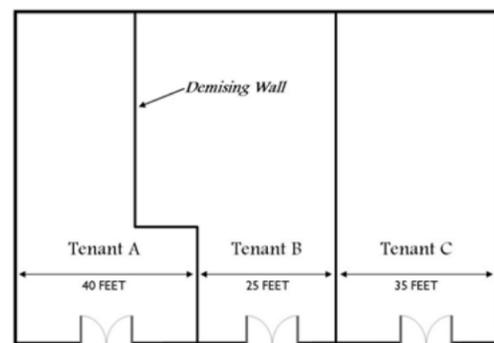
Horizontal Multiple Tenant Building Oriented Towards Street Frontage
